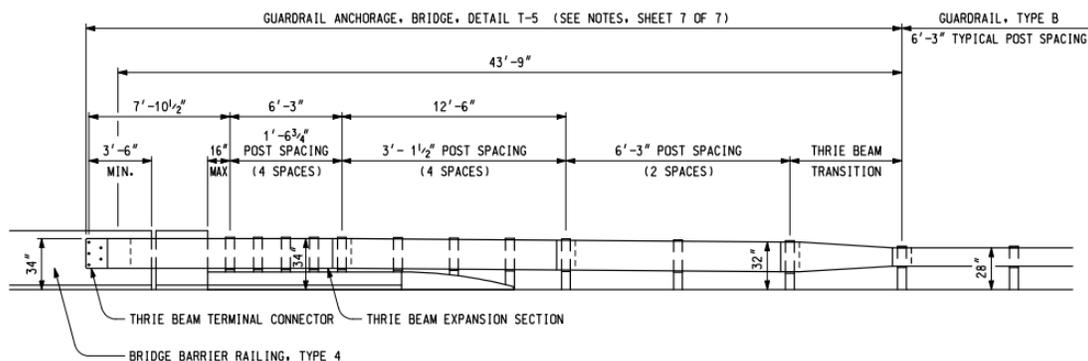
T-5 Bridge Barrier Railing Guardrail Transition
